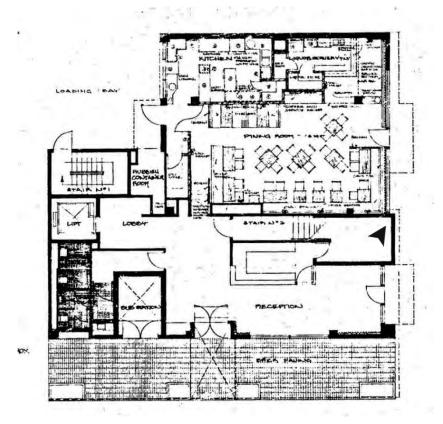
Ground floor plan detailing the reception and dining room areas. Drawing by Kenneth McDonald & Associates, dated October 1970 (BAP).
